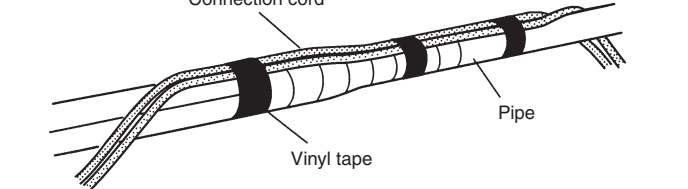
④ Left rear piping, ⑤ Left piping and ⑥ Center piping)
